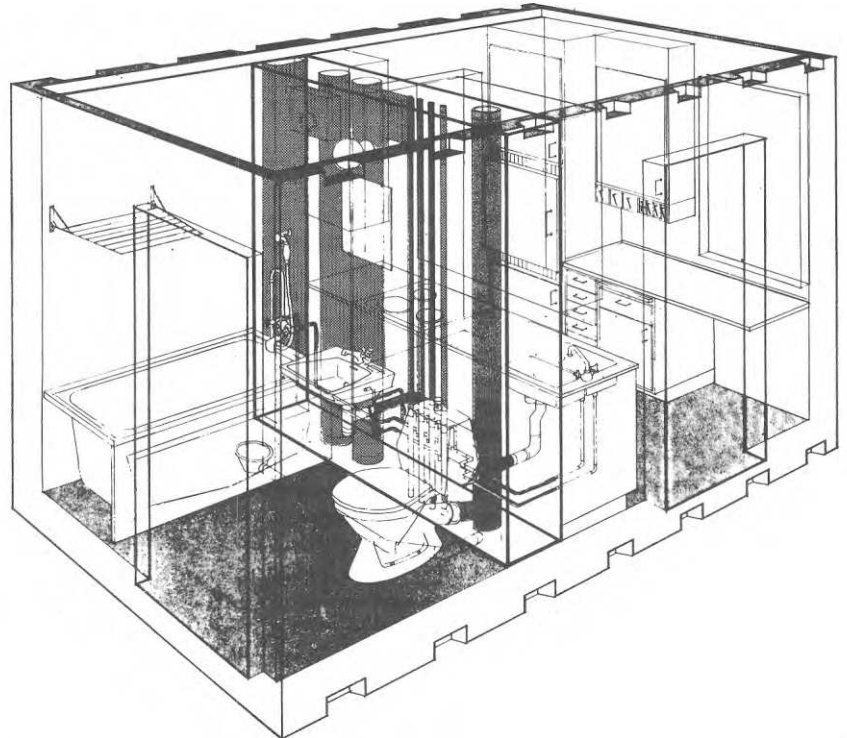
Perspective view of bulk unit containing kitchenette and bathroom manufactured by Göteborgs Stads Bostads AB.
